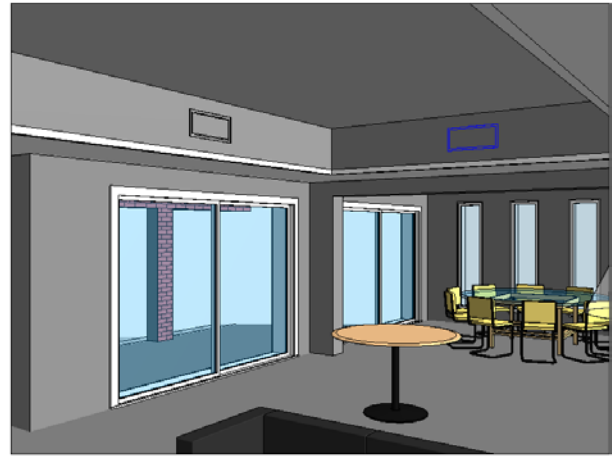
A pre-arranged view to allow seeing the HVAC grilles in the ceiling of the living room (normal mode).
